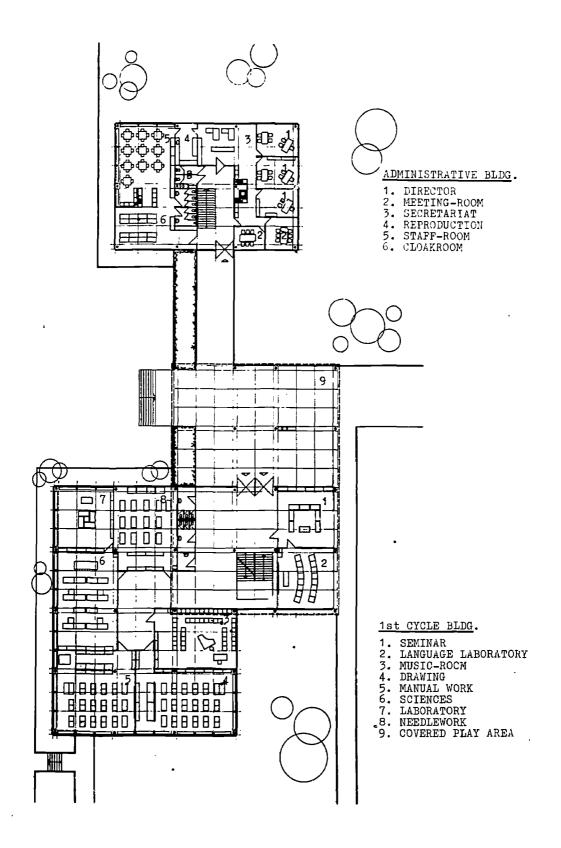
"Collège secondaire de Beausobre" - ground floor plan
